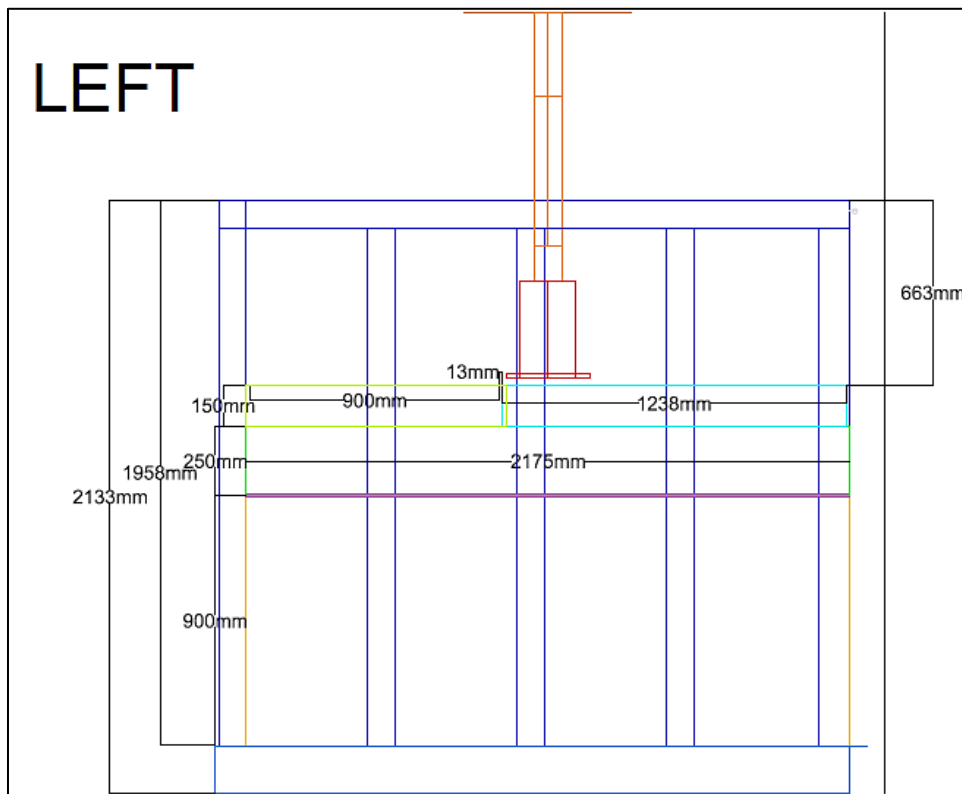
Big Box Layout with Concrete Slabs, Left View.
